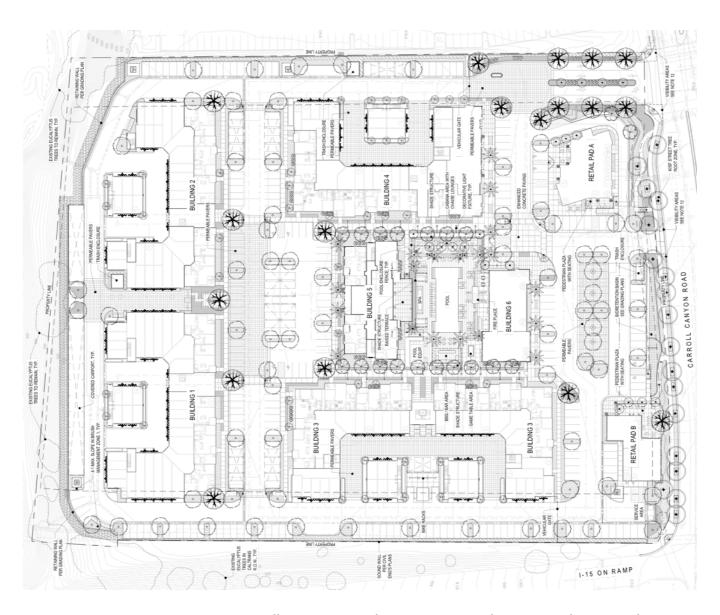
Carroll Canyon Mixed-Use Project Landscape Development Plan
